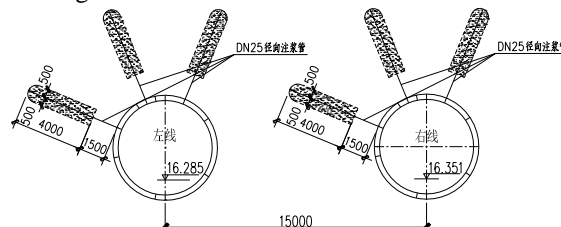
The measure of grouting pre-reinforcement (unit: mm)
